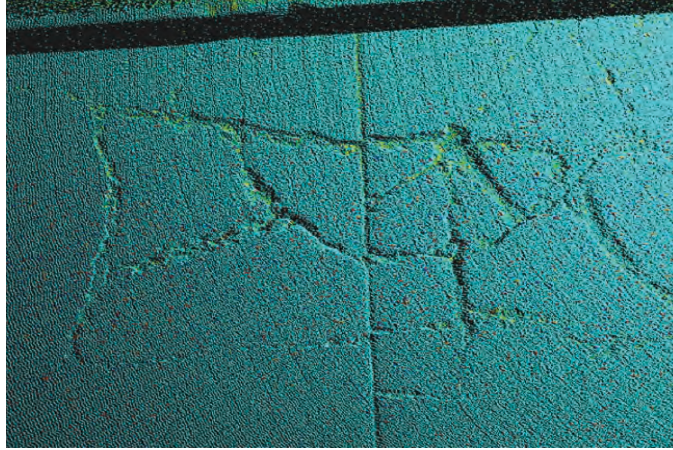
LIDAR Intensity Scan of Concrete Pavement
